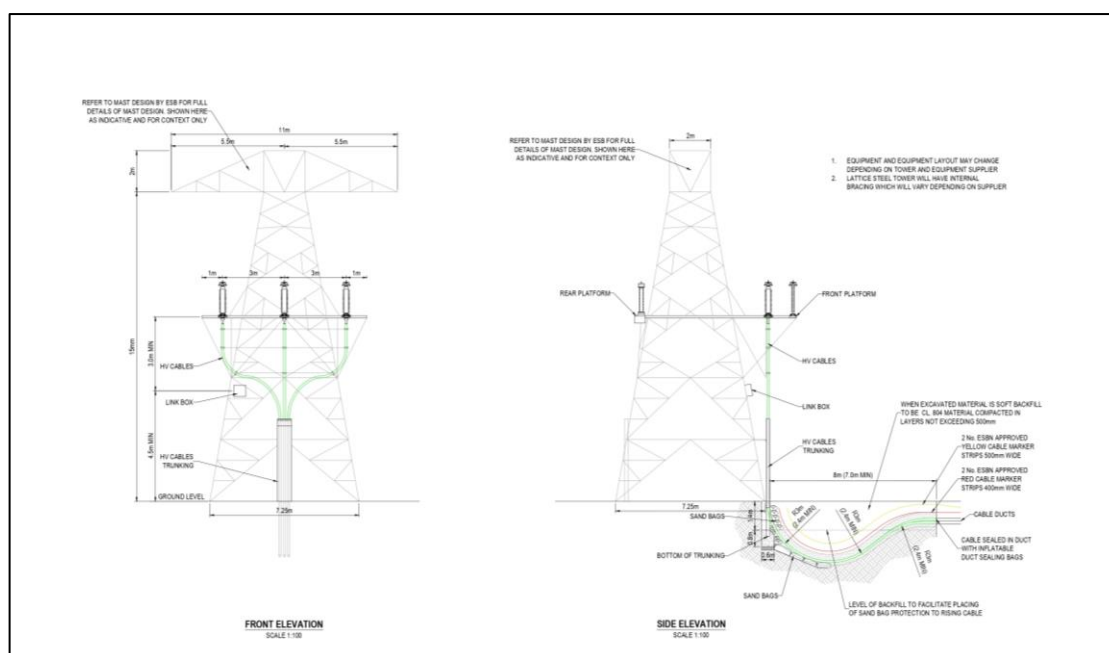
Typical lattice mast detail (CSEA Sheet: 1530)
